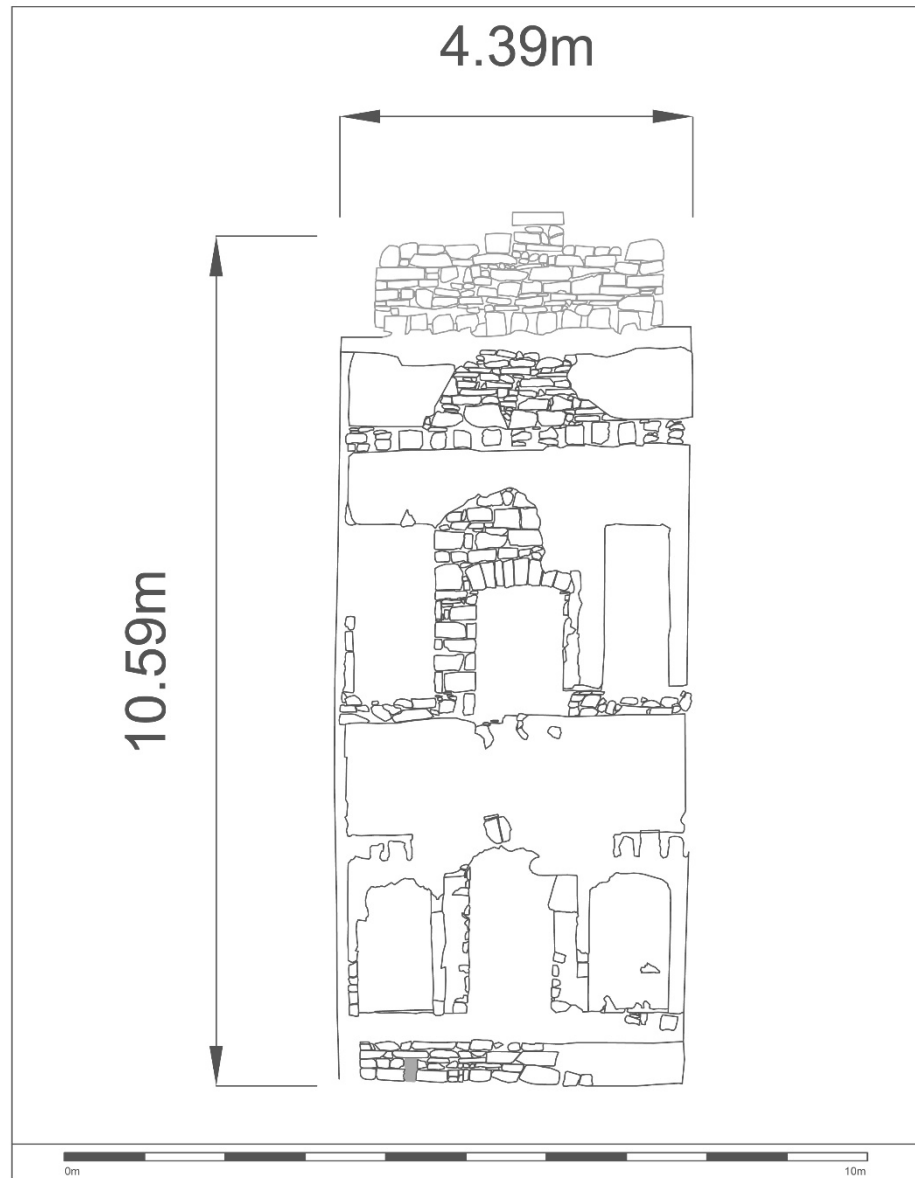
Internal elevation of the south wall of the signal tower at Carrowmably Signal Station. The chute that passes through the east part of the south wall into the semi-basement level is shaded grey.
